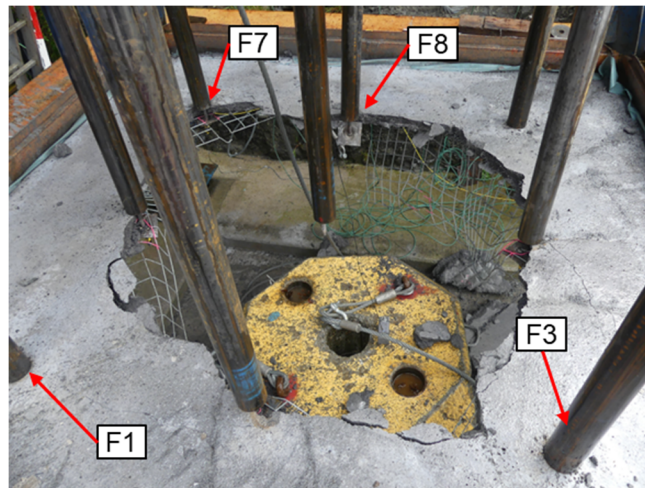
Final shotcrete layer fracture propagation around the dropped block during test LR4, showing fractures through dislodged bolts F7 and F8 while bolts F1 and F3 remain unaffected
